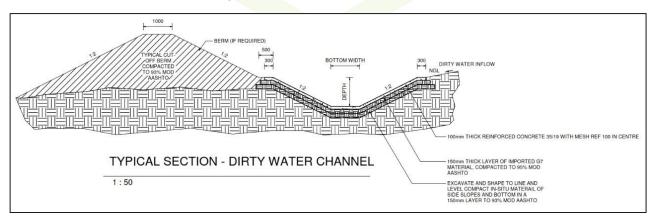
Typical Channel / Berm Cross Section For Polluted Water Diversion
